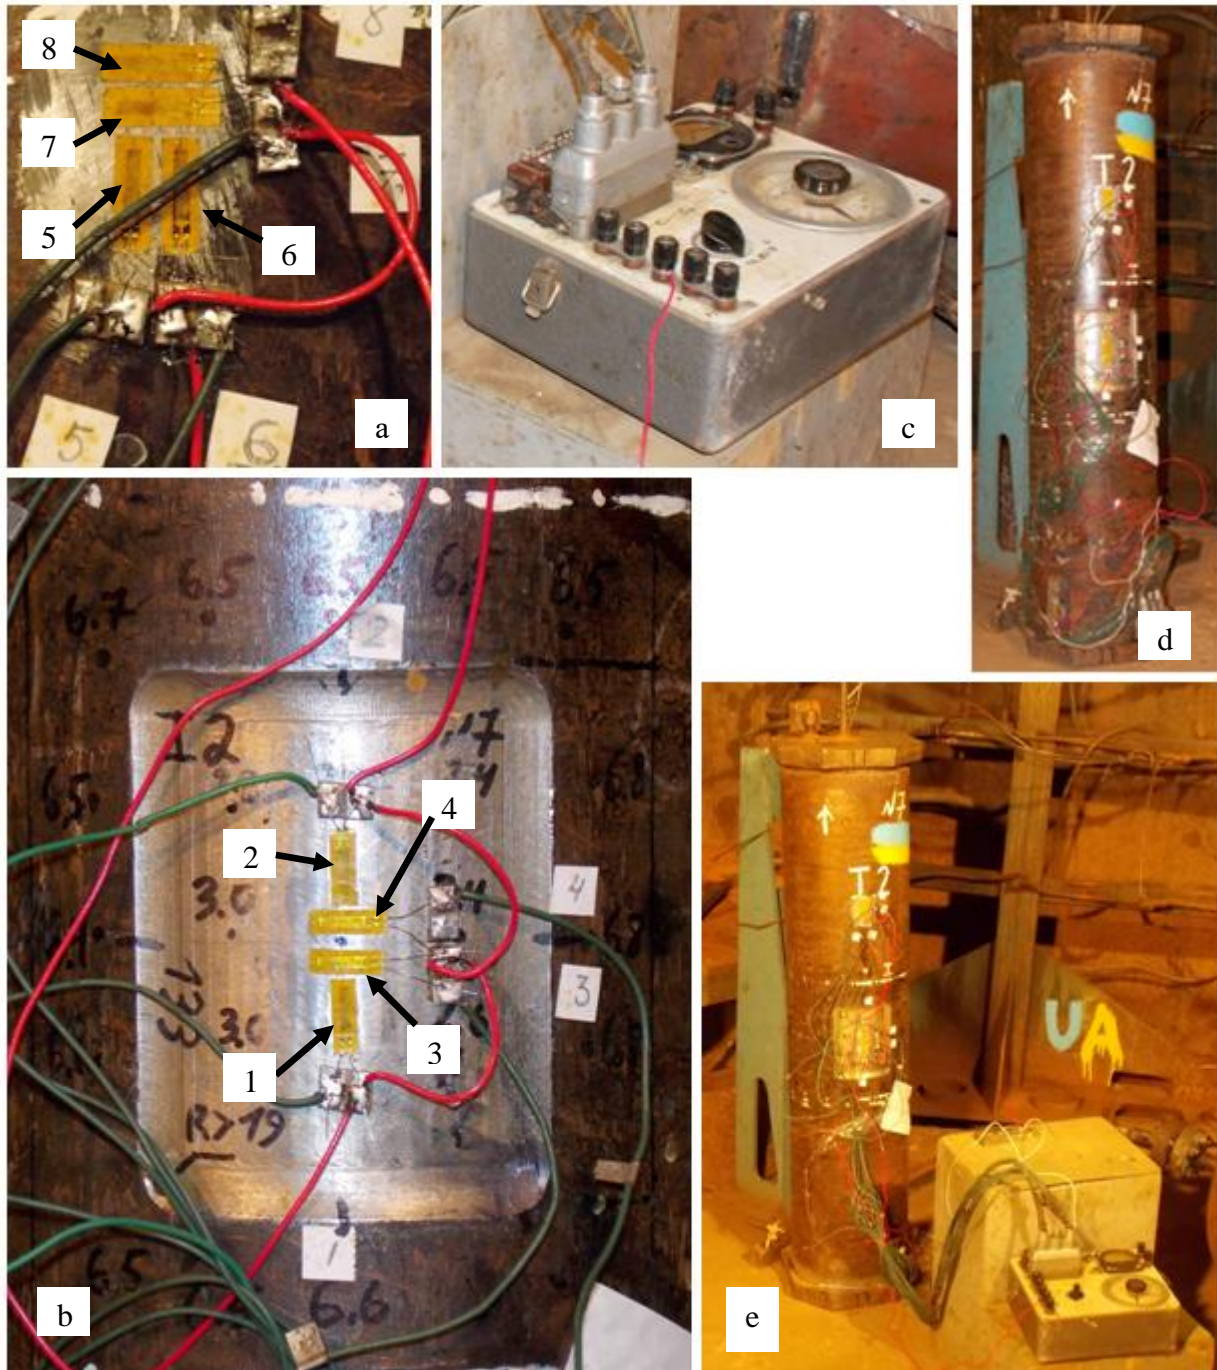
Measurement of specimen I2 strains: a - gauges 5, 6, 7, 8 location; b - gauges 1, 2, 3, 4 location; c - ISD-3 measuring device, d, e - specimen during the test.
